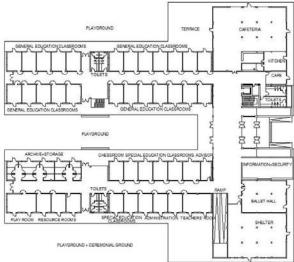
The Ground floor plan of Gökkuşağı Primary School [1-2]
